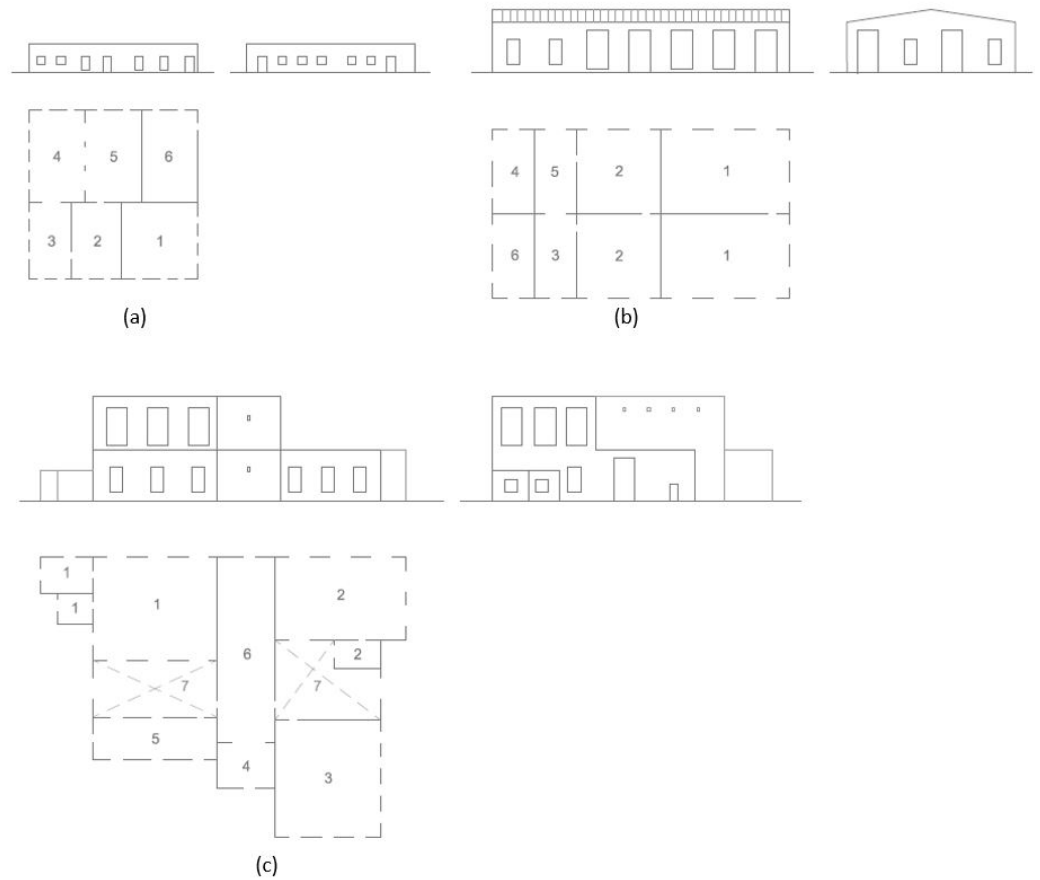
Layout of the three models. (a) Model Type 1 with flat roof. (b) Model Type 2 with sloping roof. (c) Model Type 3 with flat roof. Spaces: (1) Main house. (2) Laborer’s room. (3) Warehouse. (4) Pen. (5) Stable. (6) Hayloft. (7) Yard.
